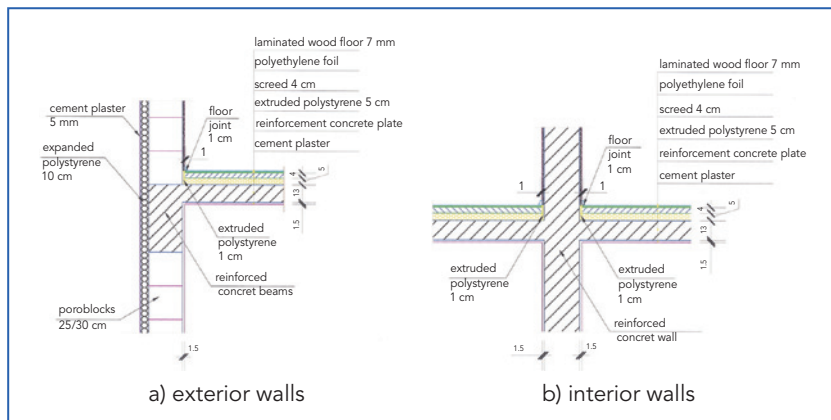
Example of the rigid contact between the walls and the slabs, high buildings.
